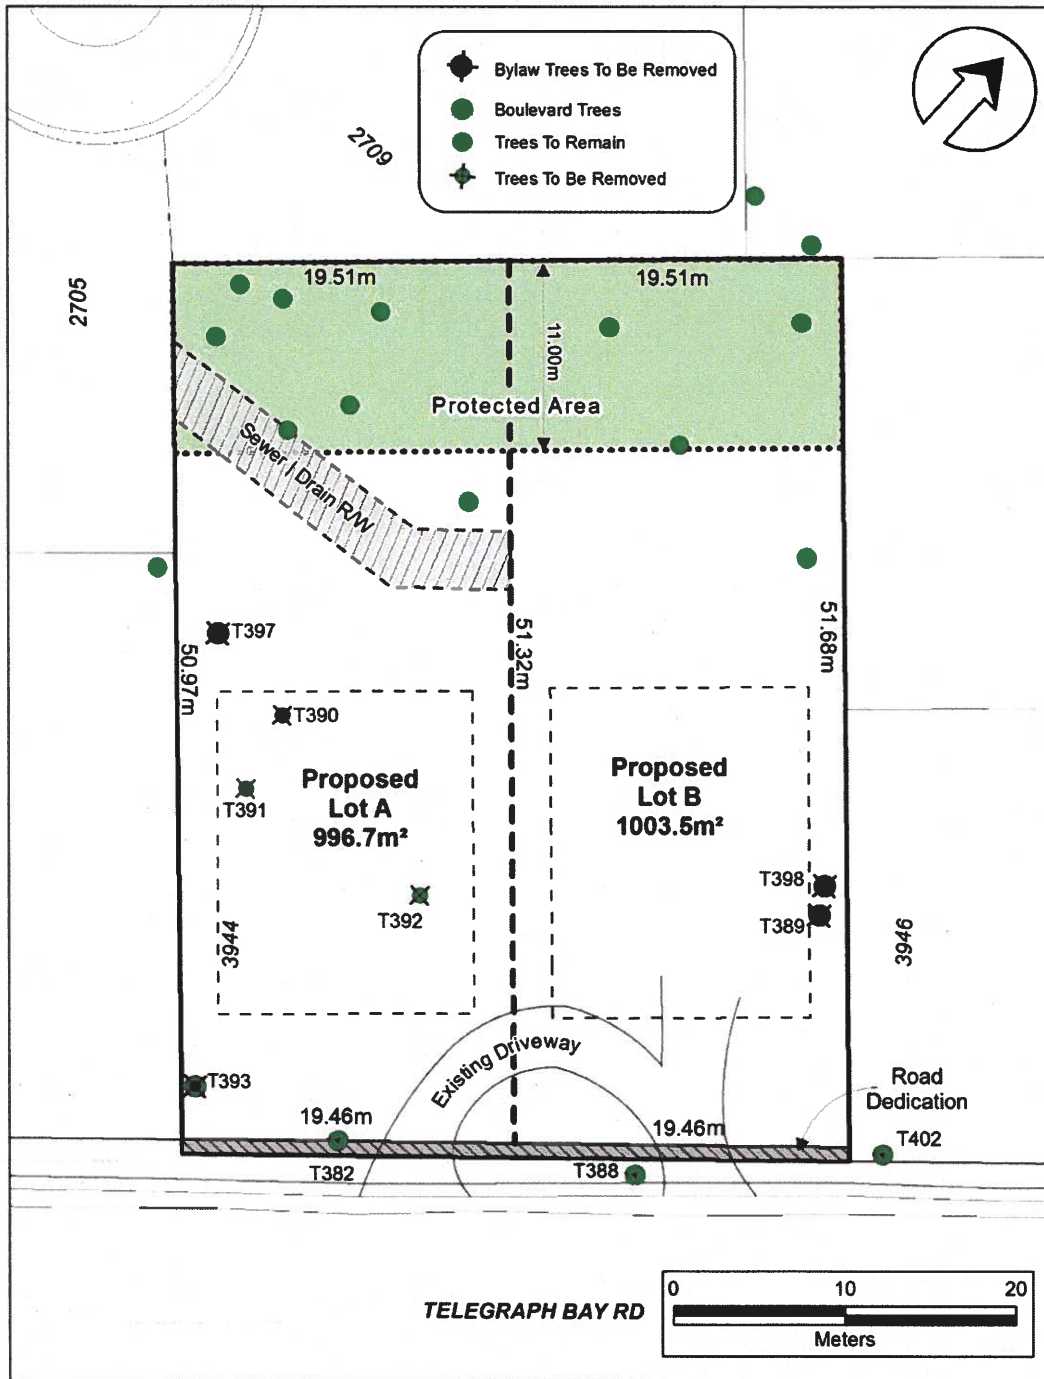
Survey of Proposed Subdivision (from plans prepared by Kenneth Ng, BCLS)
